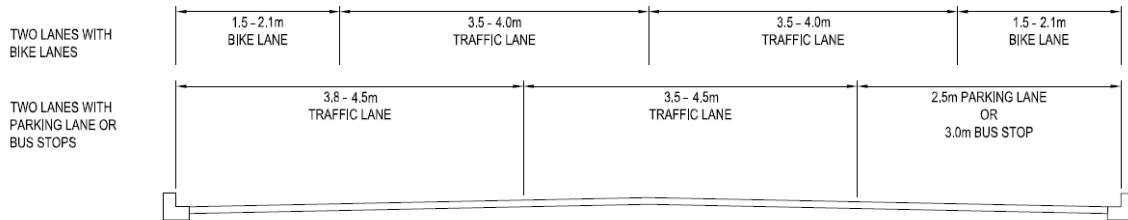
Collector Road Cross Section (10 – 12 metre width)
